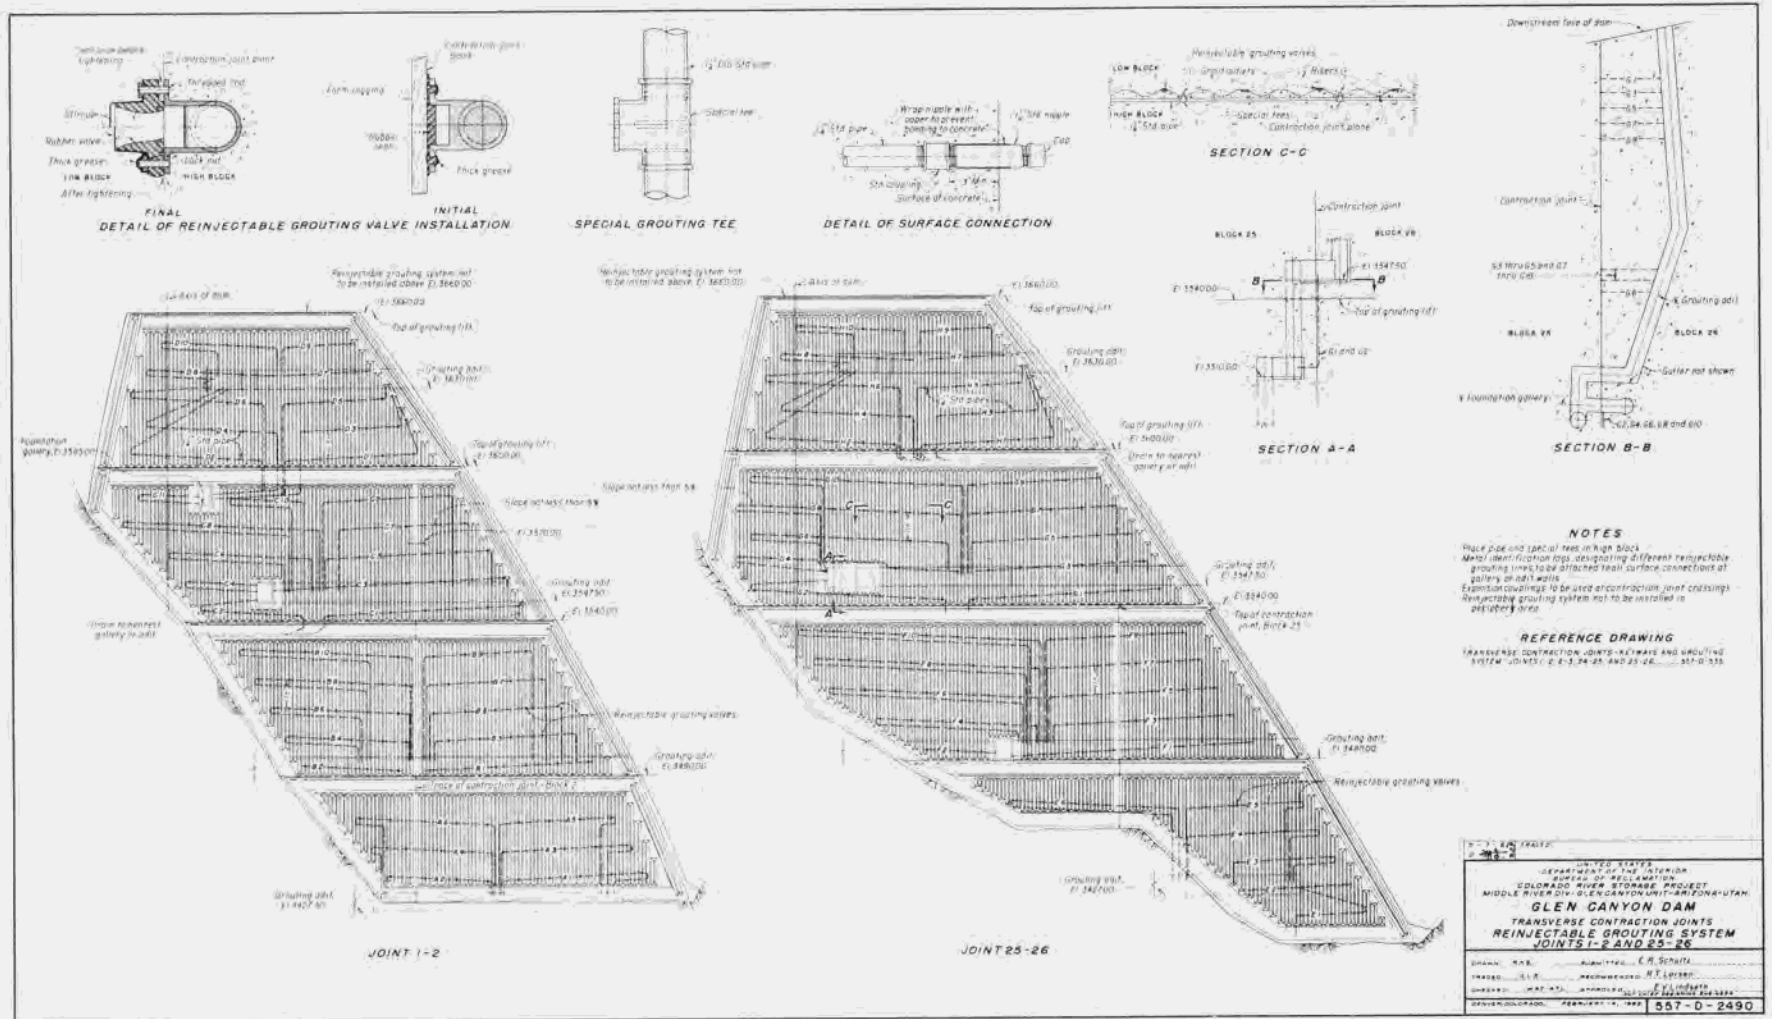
Dam transverse contraction joints—Reinjectable grouting system of joints 1-2 and 25-26.
